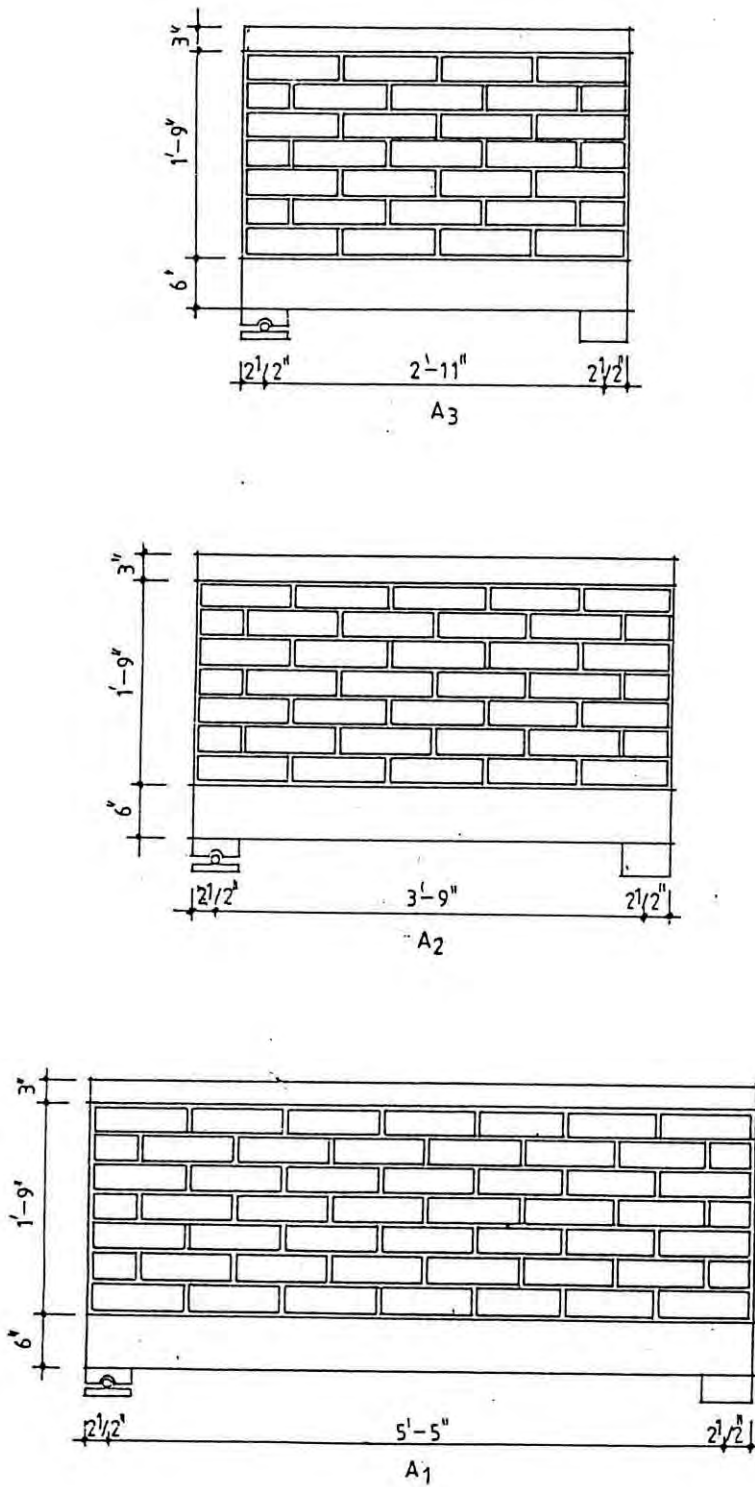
Running Bonded Composite Wall-Beam Group A
